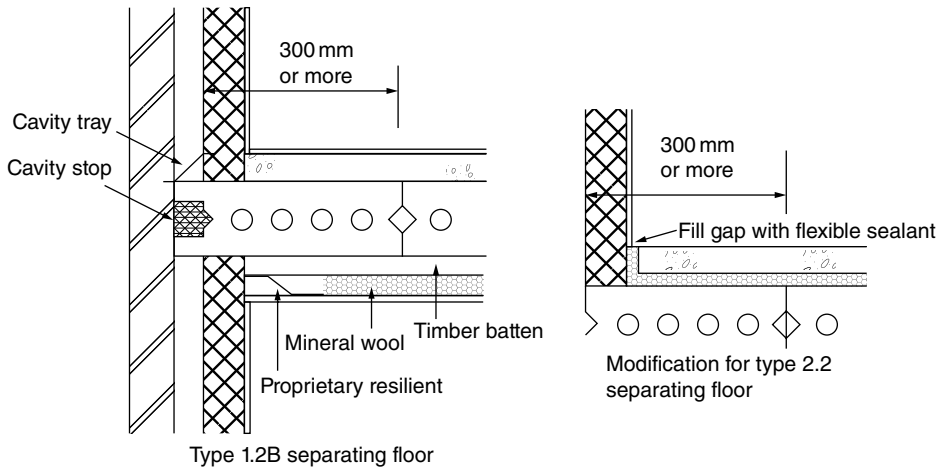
Details of junctions between Type 1 and 2 separating floors and external cavity walls.
